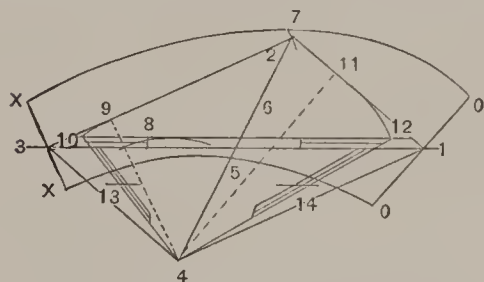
THE MOULD COVERING PLAN, FIG. 124, AND ELEVATION, FIG. 129.
